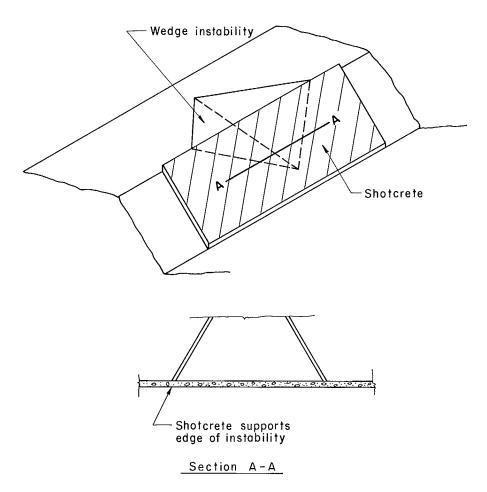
A layer of shotcrete may provide support to a wedge instability.
